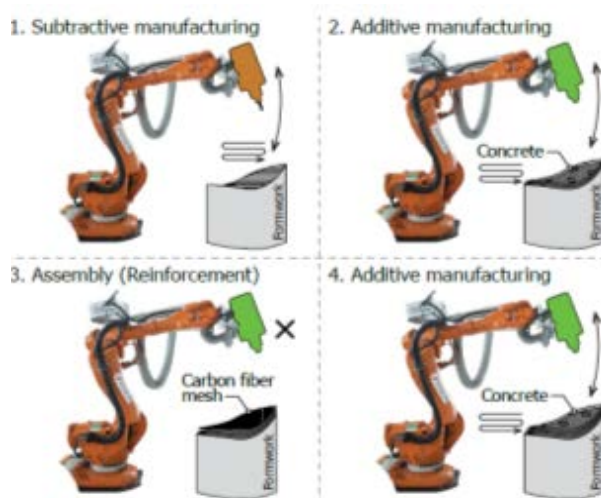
Hybrid manufacturing technique using CNC-Milling and Additive Manufacturing.
